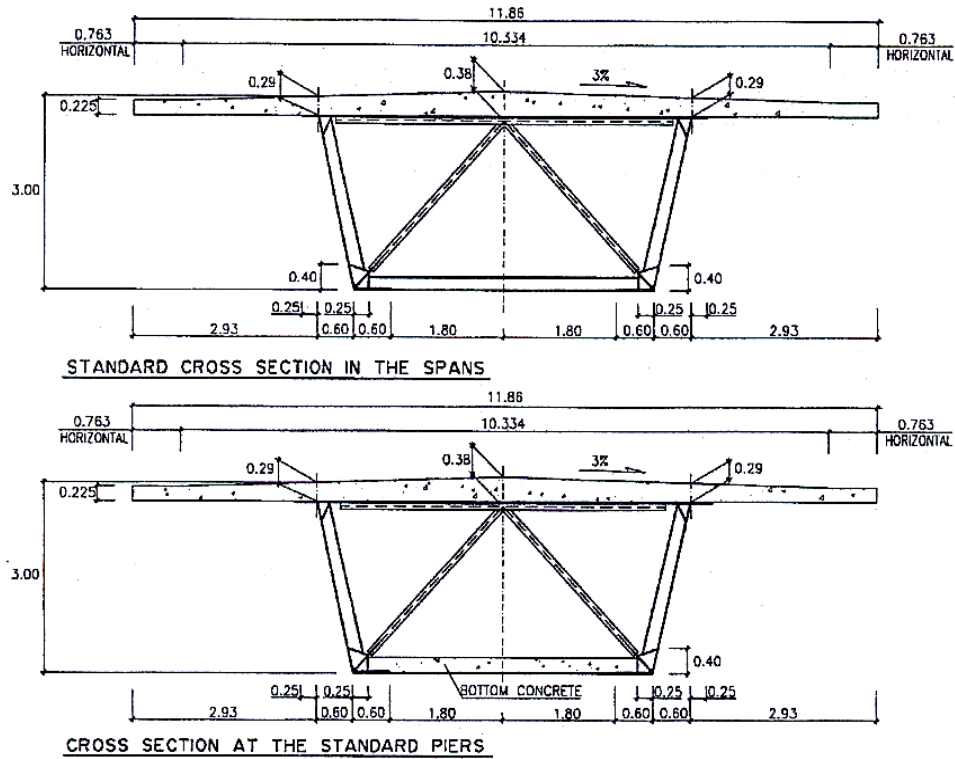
Cross-section of St. John River Bridge, New Brunswick, Canada
